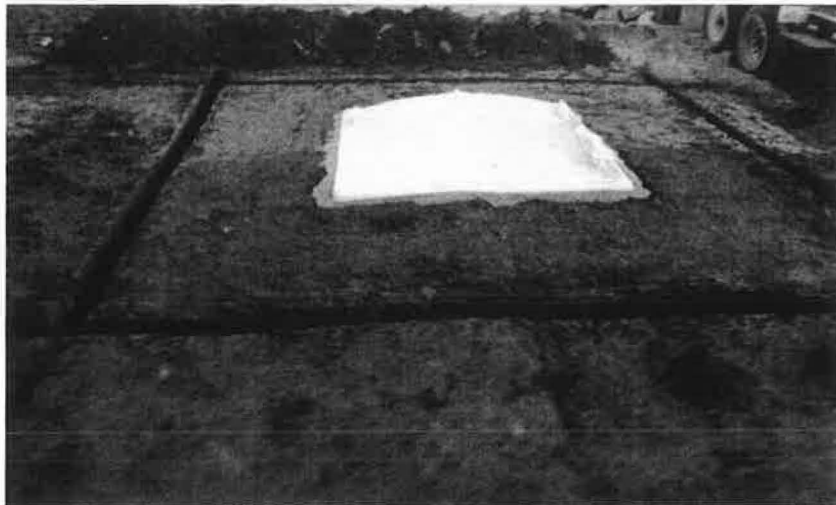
Inner ring set in place with the excavated outer ring trench.
